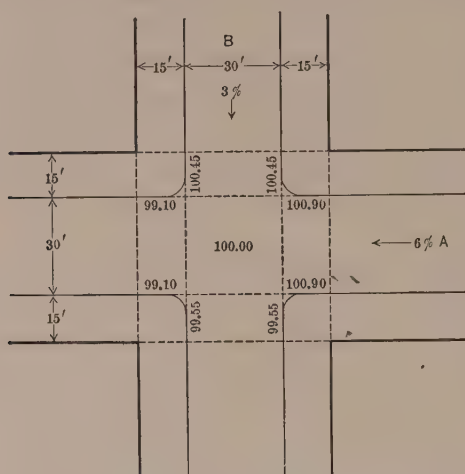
Elevations at Curb Corners from Intersecting Grades.
